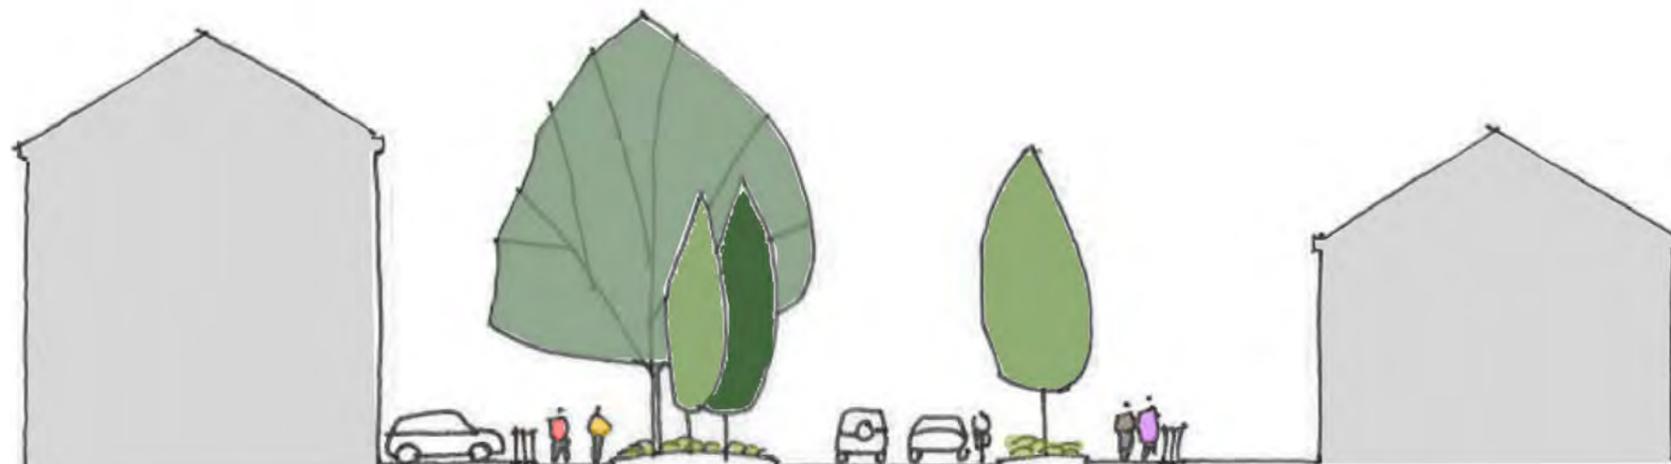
Illustrative section of a typical residential street in the Woodland area of influence
